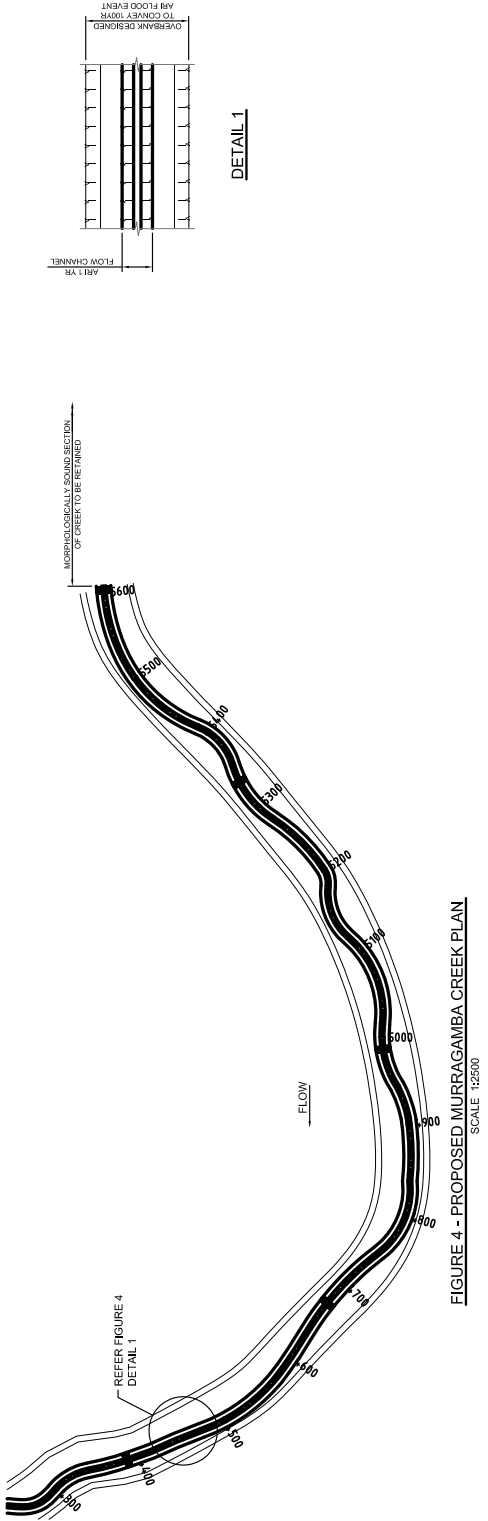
PROPOSED MURRAGAMBA CREEK PLAN
